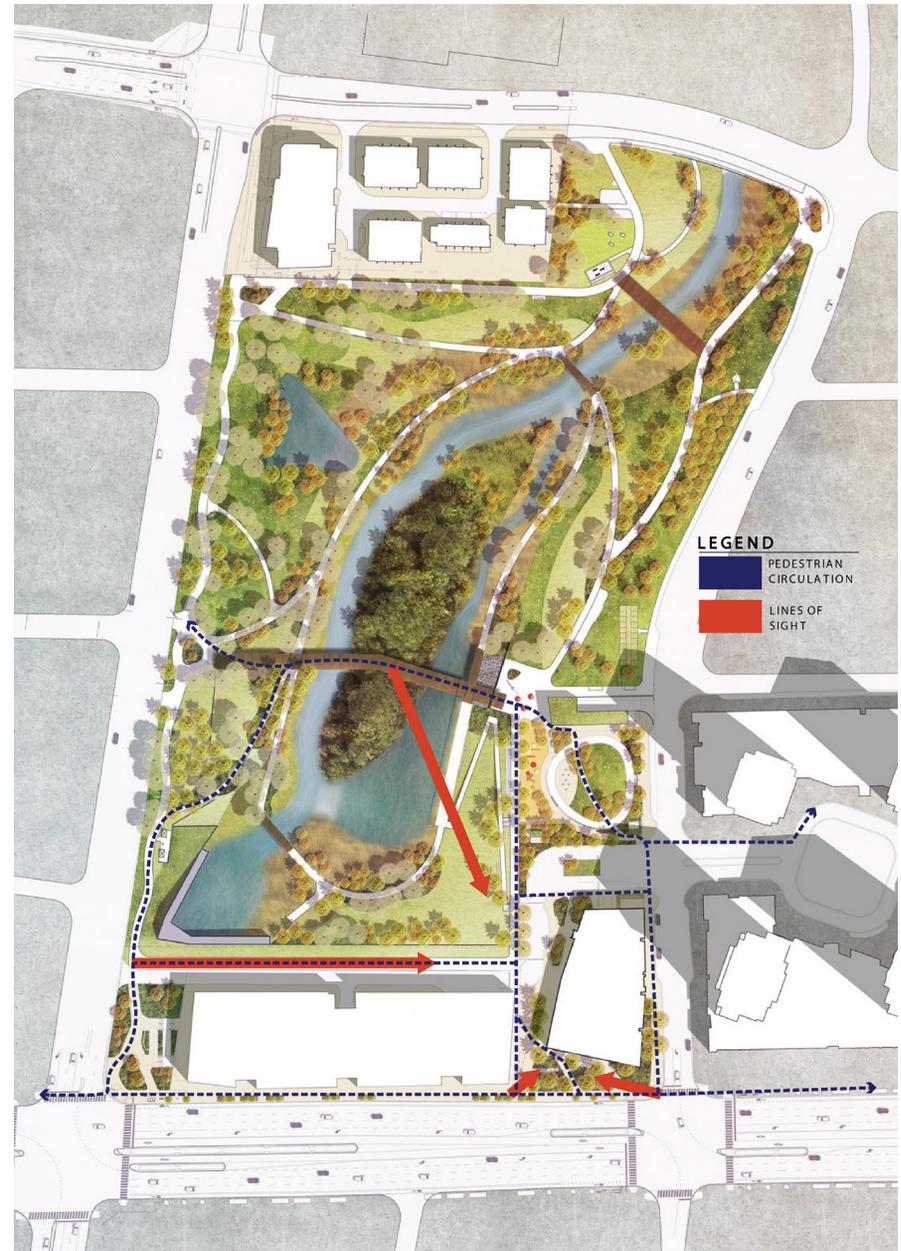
, Edgeley Pond & Park with CG Tower site Landscape Plan.
